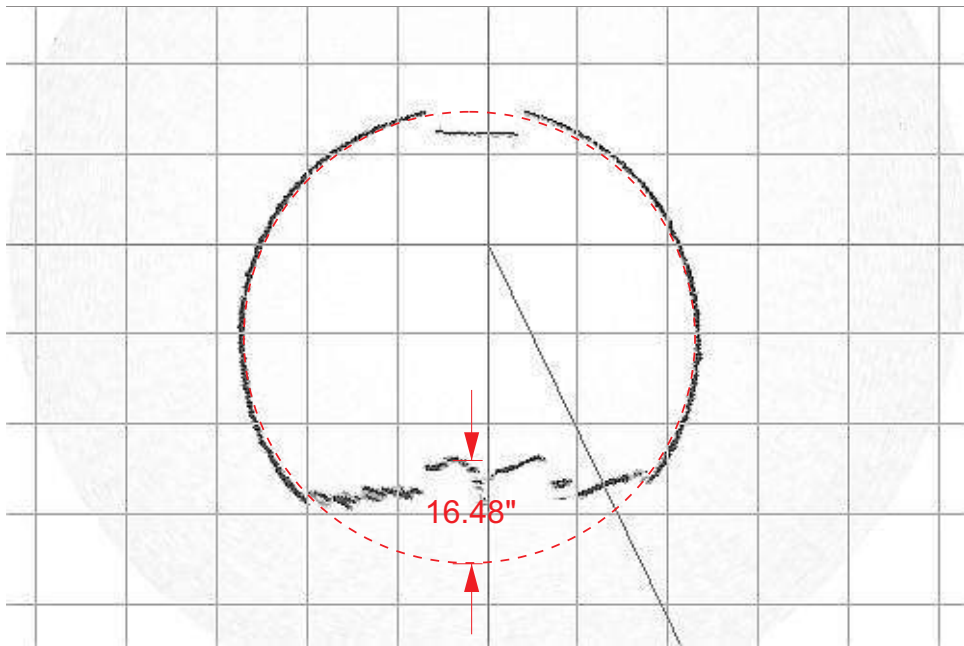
Sonar Profile 1 - 786 feet downstream of Access Point 1.
